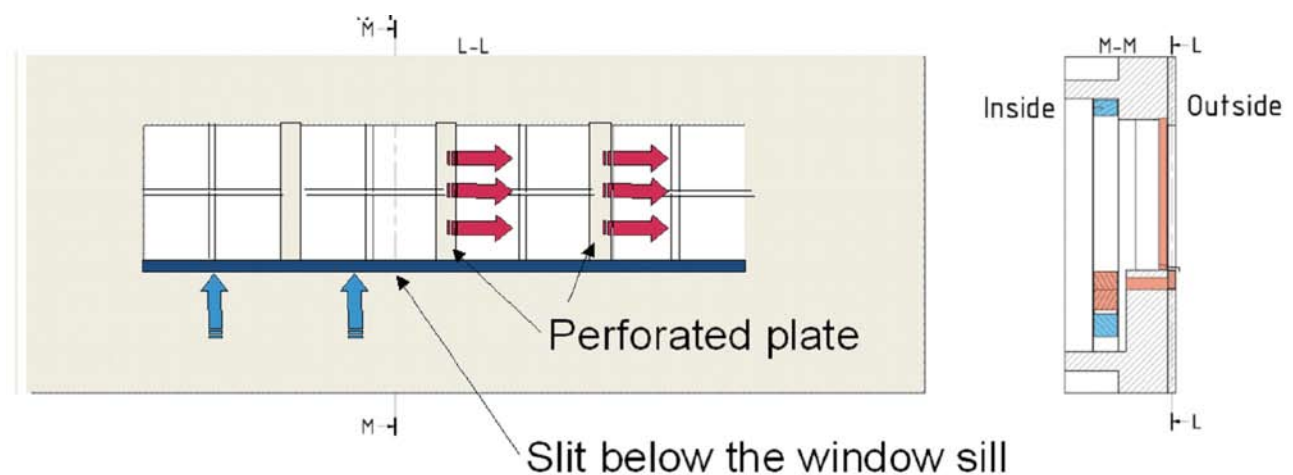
Wall integrated decentral ventilation system (view from outside). Exhaust air outlet via perforated plate, outdoor air inlet via slit below the window sill.
